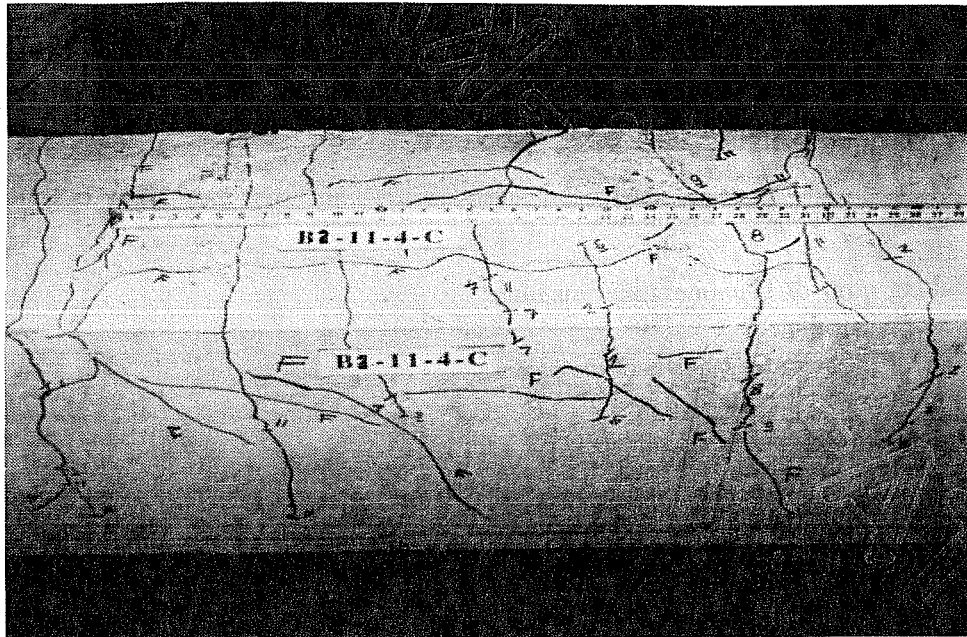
Face-and-side split failure of the epoxy-coated bar Specimen B2-11-4-C.
